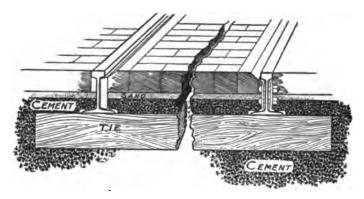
Track Construction in Asphalt Pavement in Milwaukee.
